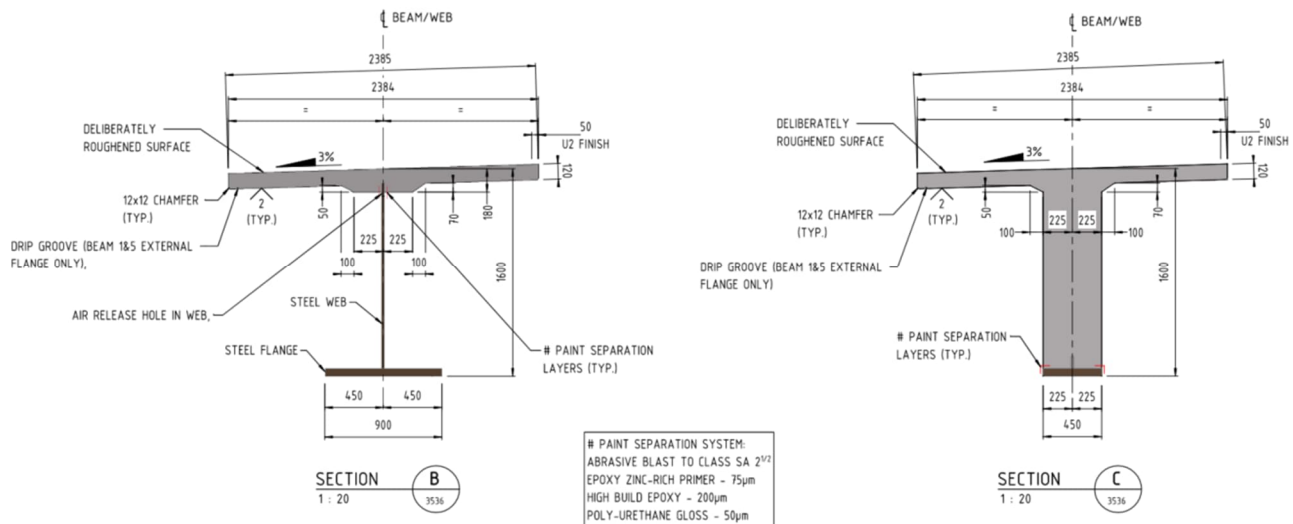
Cross sections of a hybrid beam for Bridge 0997A
